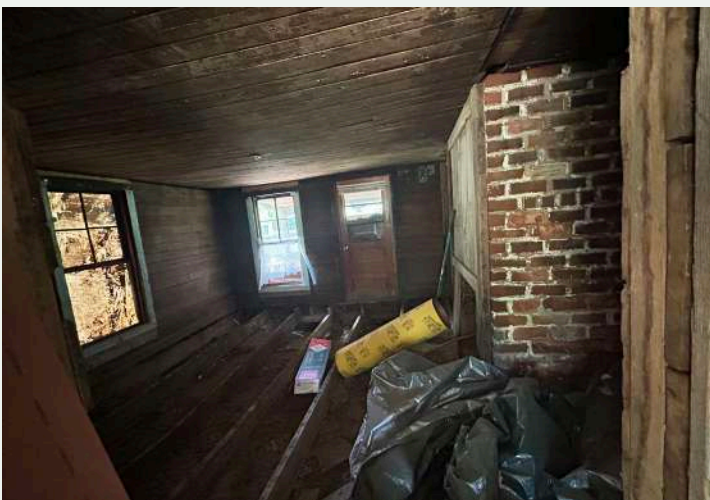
Room to the west of the chimney, looking from kitchen addition entrance, into the tenant house.
